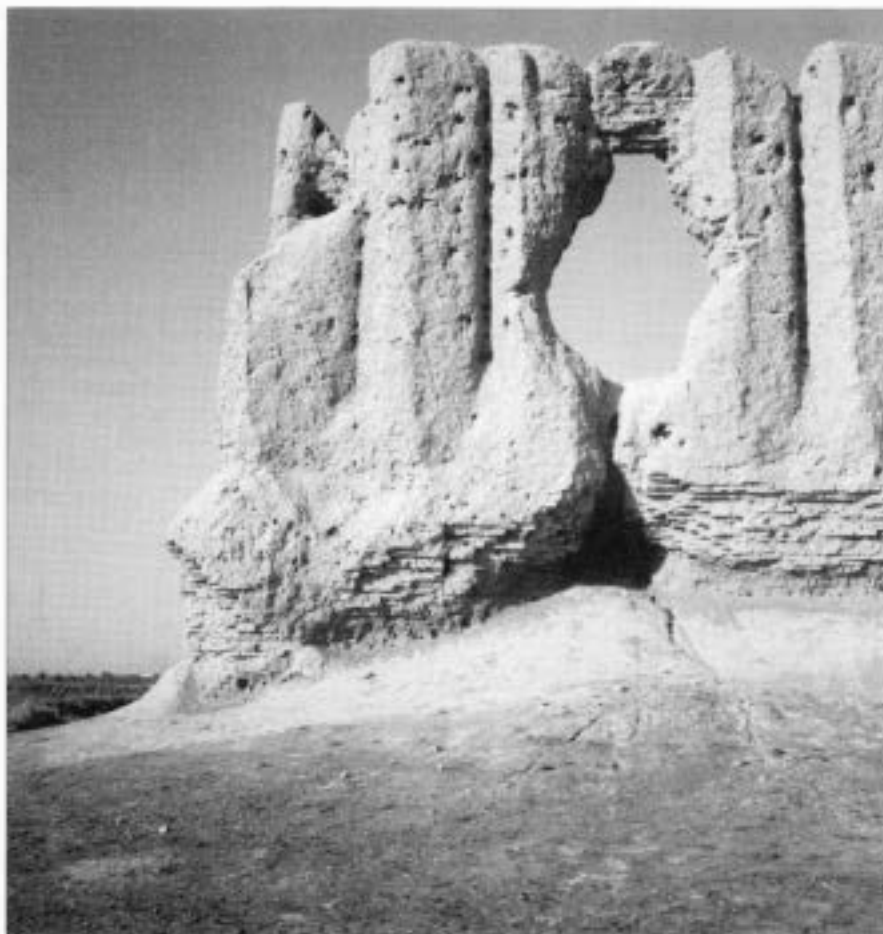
Mudbrick walls of one of the medieval buildings at Merv, Turkmenistan, undermined by salt damage.
